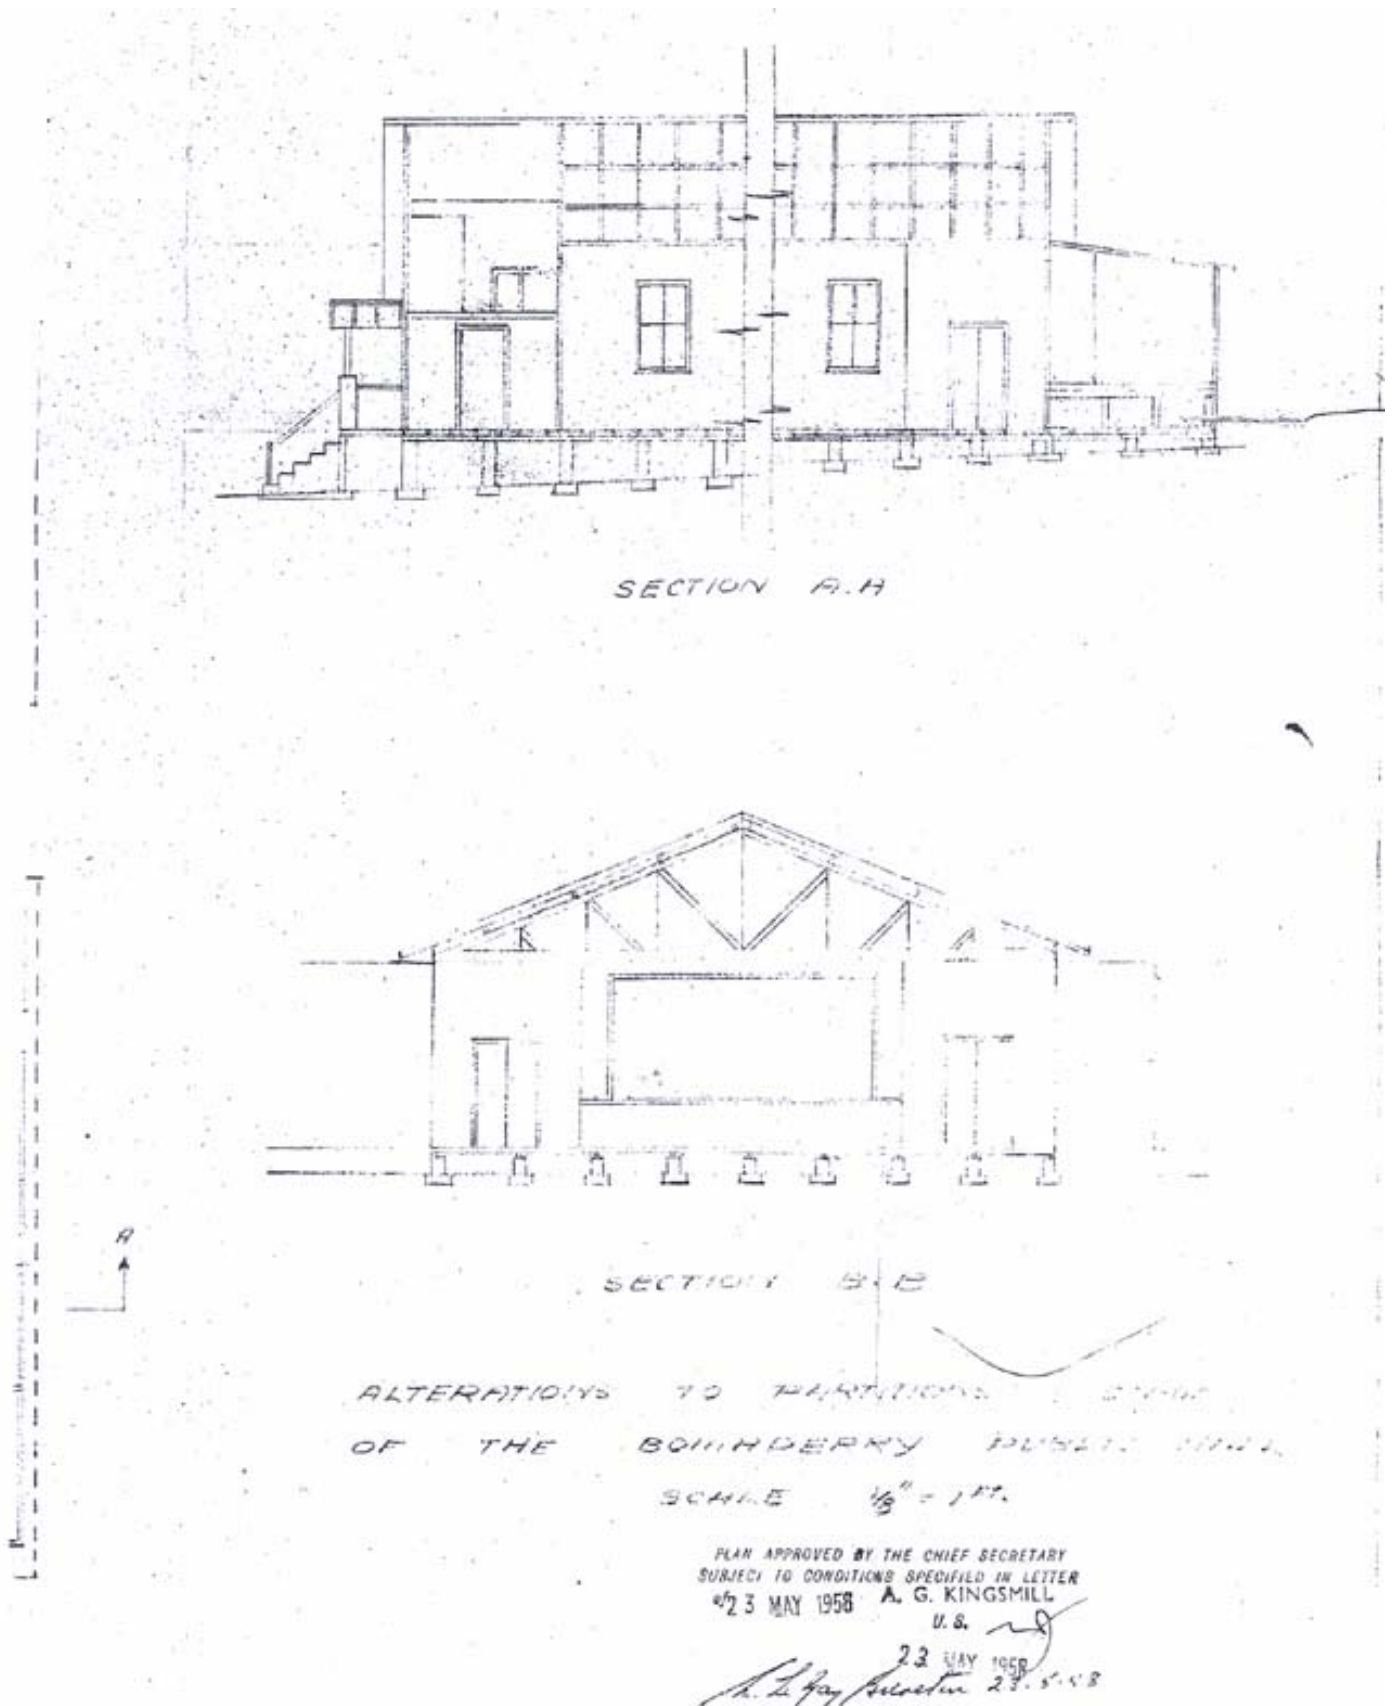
This plan (as well as Figure No.29a) from 1958 shows the internal features of the hall to be demolished, namely the band stand, kitchen and supper room, to make room for the stage and two dressing rooms. They also show the elevations and sections of the design.
